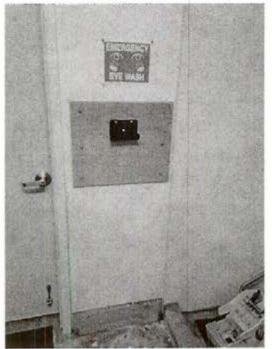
Building 6A chemical storage/use are missing an emergency eyewash station.
